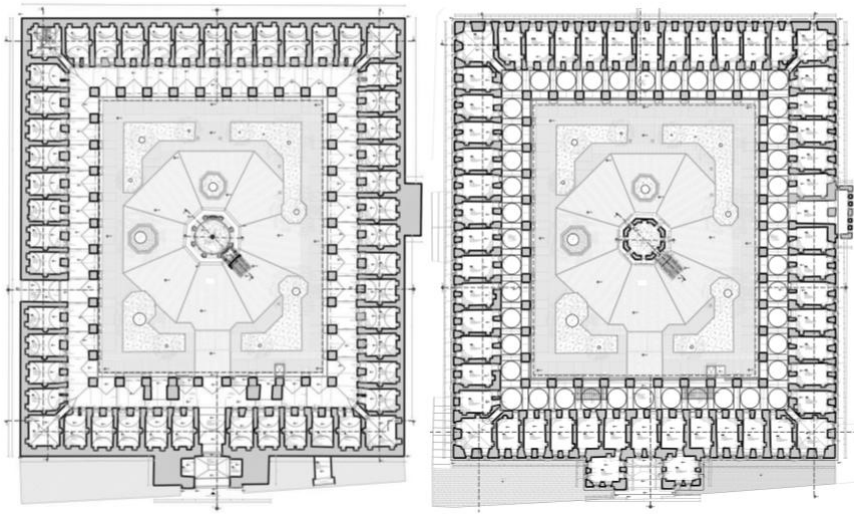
Ground Floor Plan (left) and First Floor Plan (right) of Koza Han (Bursa Metropolitan Municipality, 2024).
